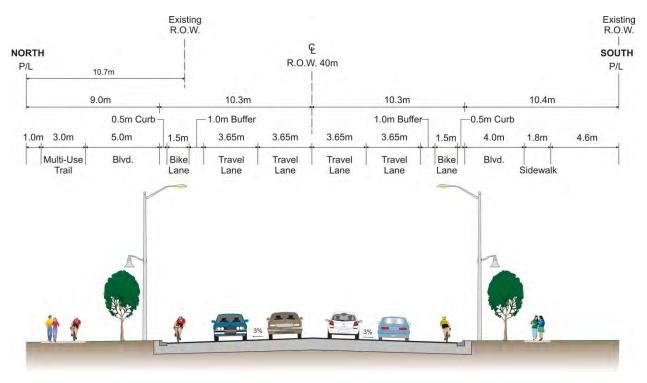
PIC 2 TYPICAL CROSS-SECTION COUNTY ROAD 42 8th CONCESSION ROAD TO THE CITY/COUNTY BOUNDARY
